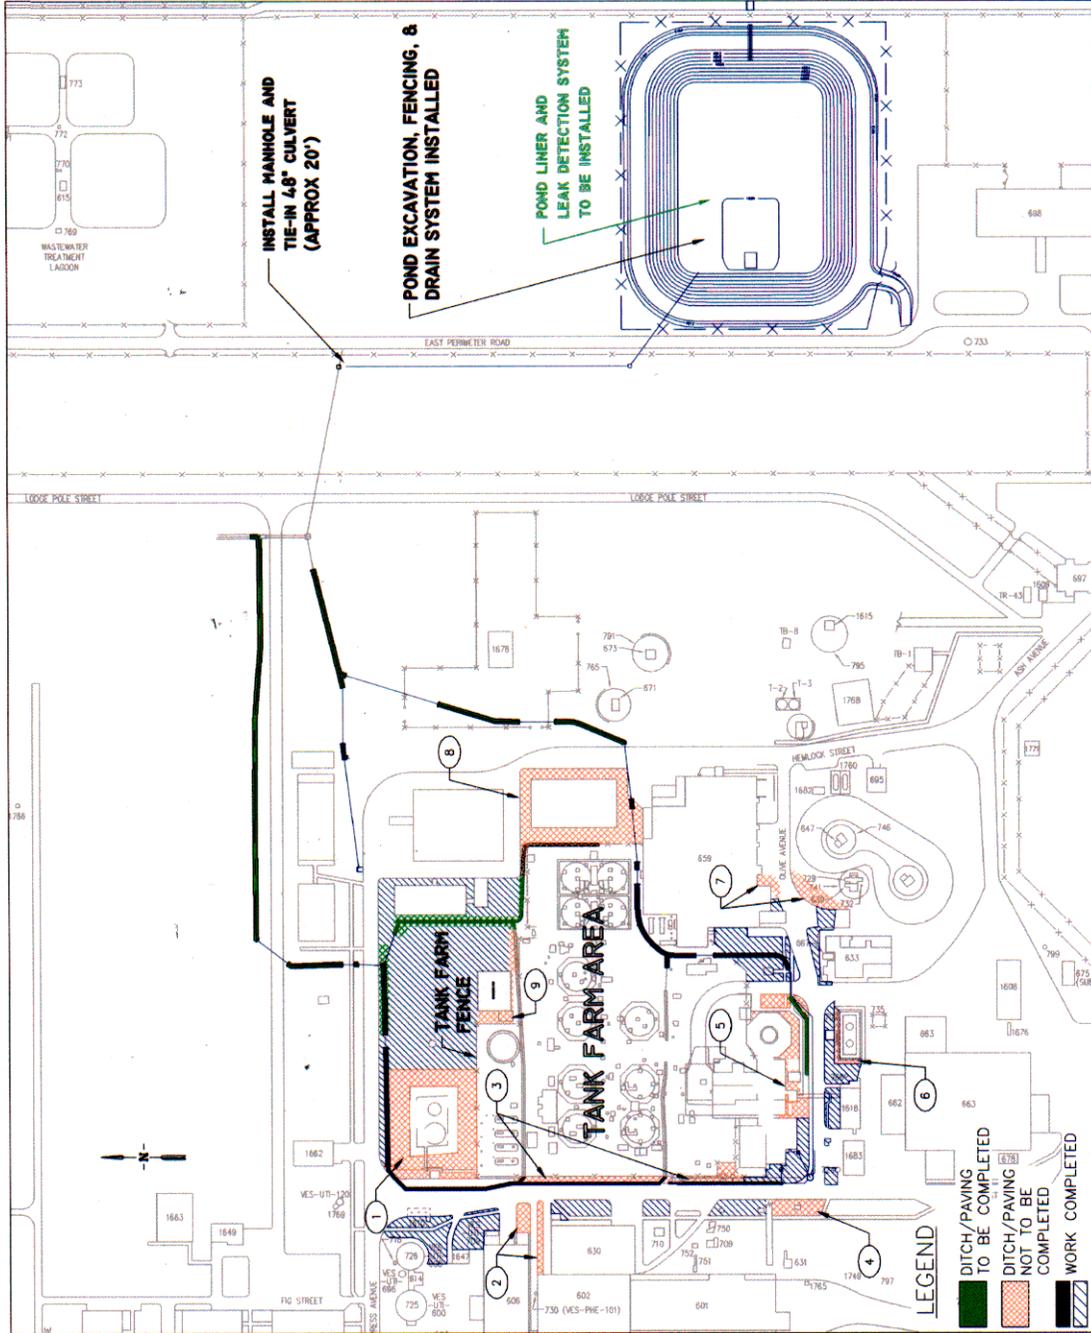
Locations of TFIA areas to be disturbed, including upgraded ditches, lift station, stormwater drainage system upgrades, new culverts, and evaporation pond.
